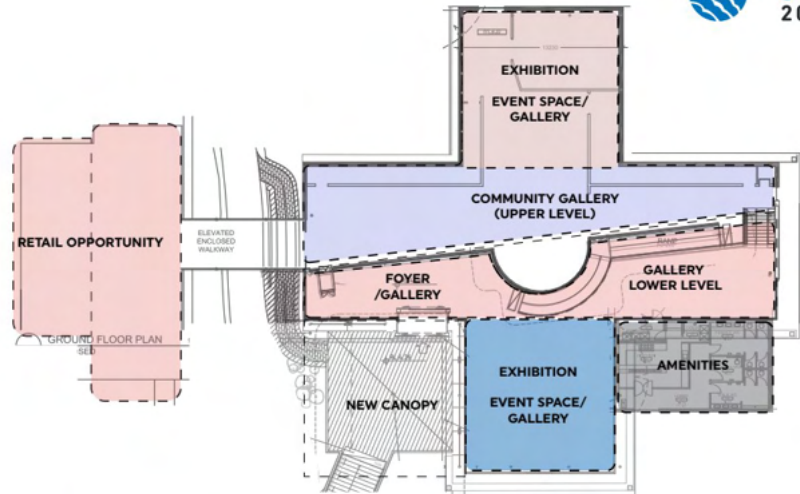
Signal Point Park |Precinct Master Plan 2021|
